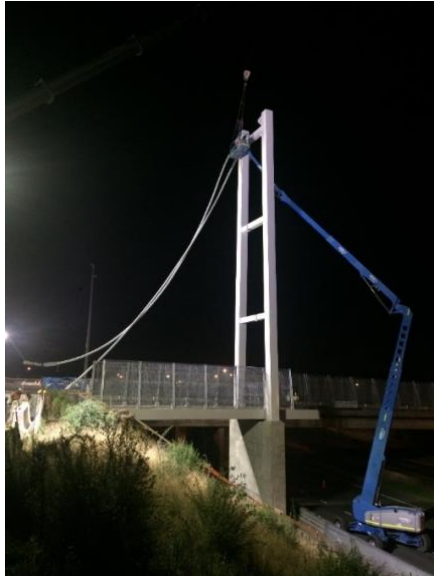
Typical EWP and Bridge Inspection Vehicle Set-up
